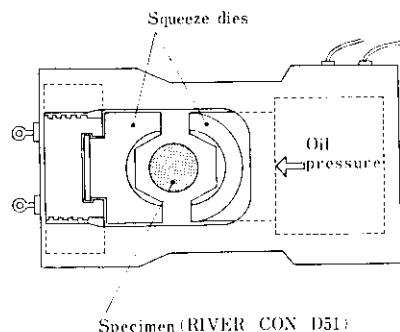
Squeezing machine for TS-type Sleeve Joint
